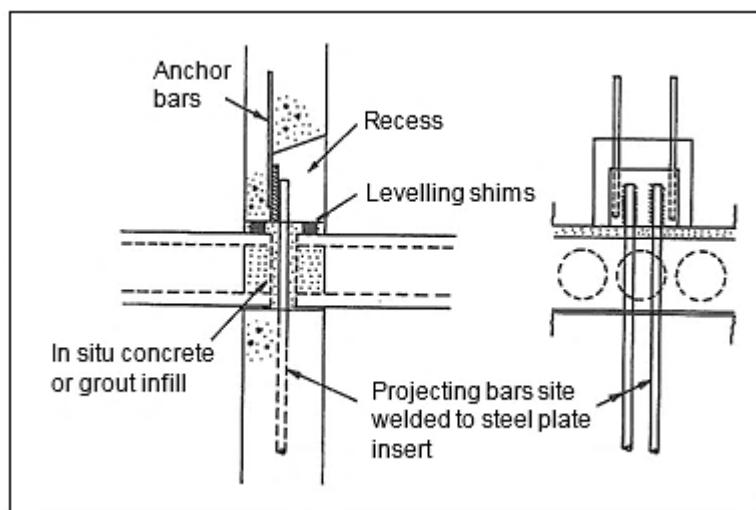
Horizontal wall to wall connection using welded joint (Elliott & Jolly, 2013)
